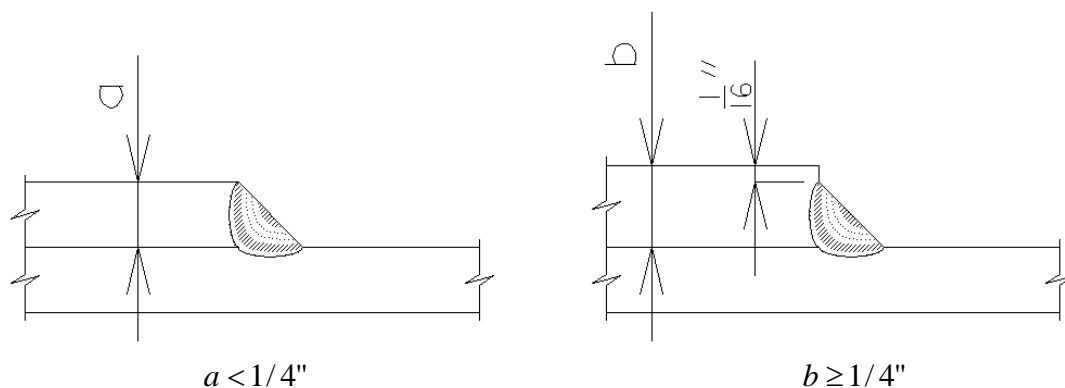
Maximum Fillet Weld Sizes
